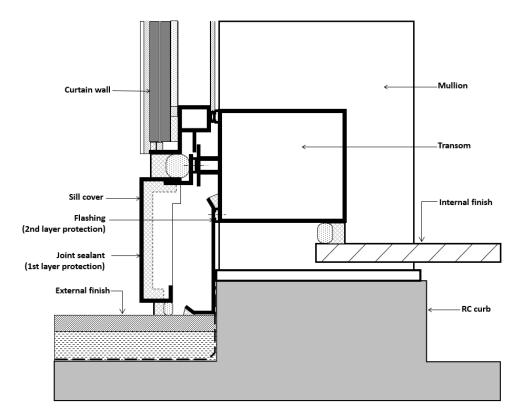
Drawing illustrating double layer protection at bottom flashing, in this case sealant (1 st layer of protection) and flashing (2 nd layer of protection).
